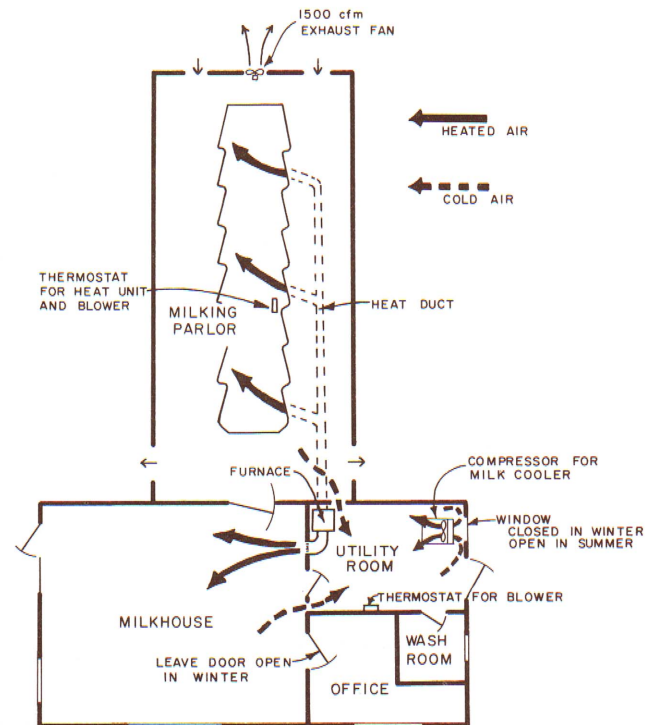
The heat from the milk cooler and other equipment is delivered to the milkhouse and milking parlor through a duct system. The heat unit in the furnace supplies additional heat when needed.
